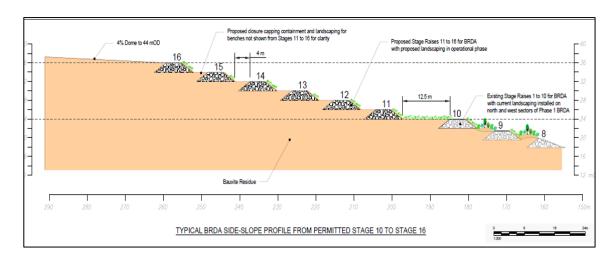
Typical BRDA Side-Slope Profile from Permitted Stage 10 to Stage 16
